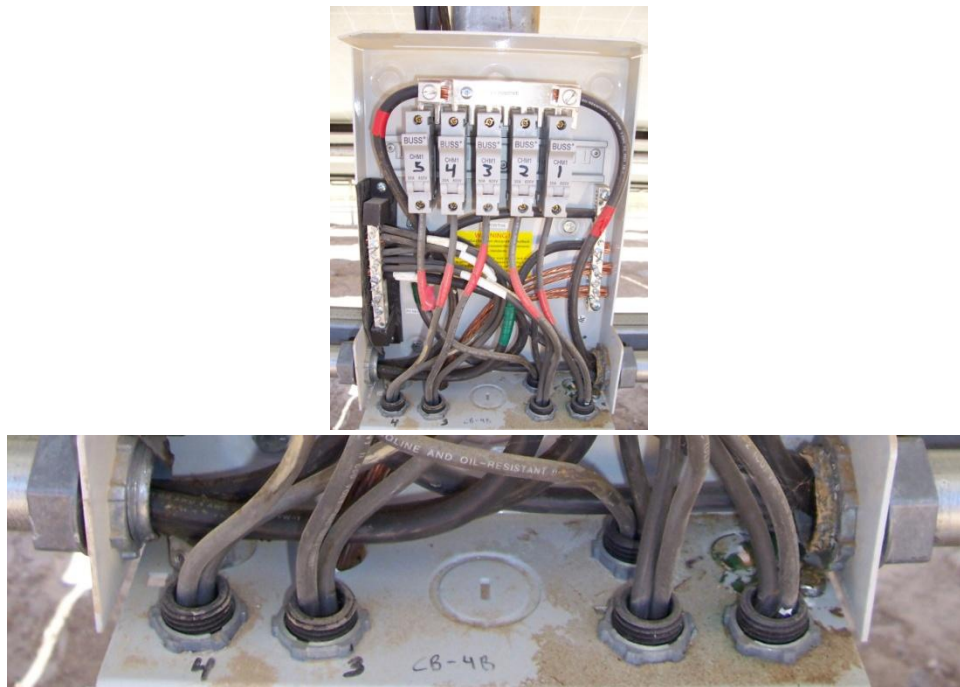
proper cable glands with 2-conductor inserts in combiner box (correct)
